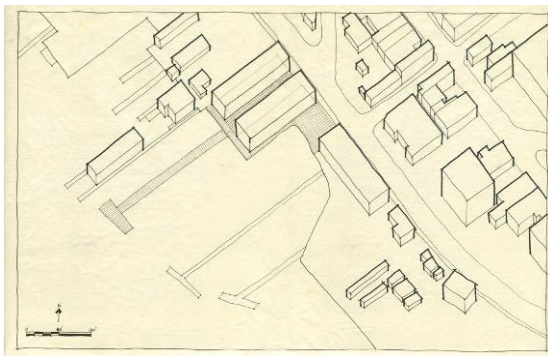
Site axon showing site in context with building heights of surrounding buildings.
